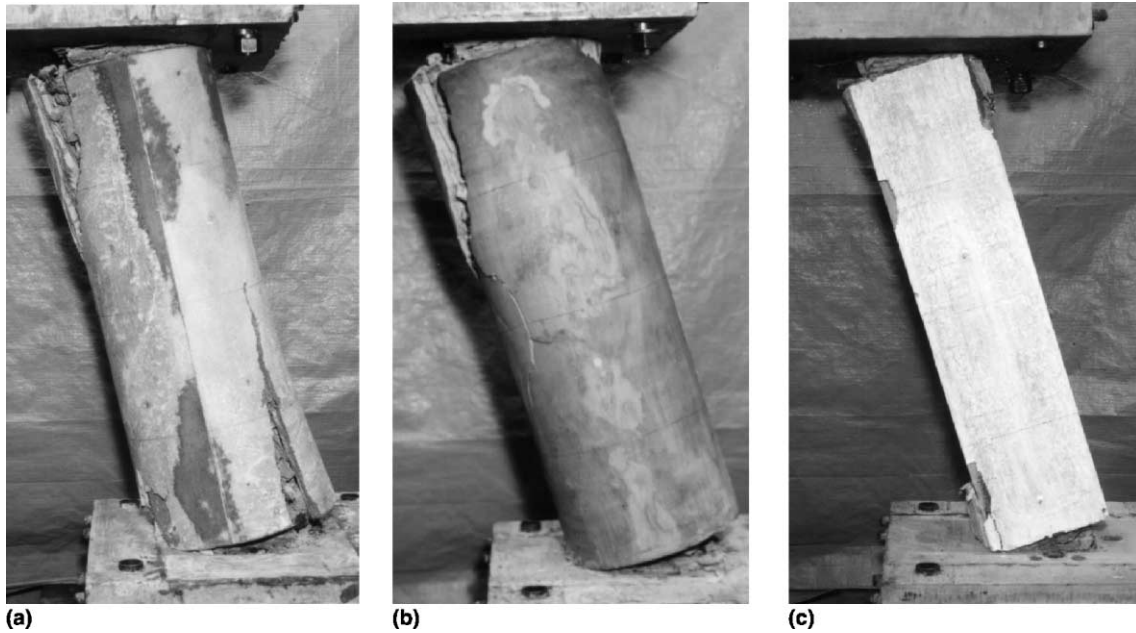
Typical failure types of jackets after the tests. (a) column CJ-AL10-6L; (b) column CJ-AL15-6/3L; (c) column SJ-AL15-6L.
